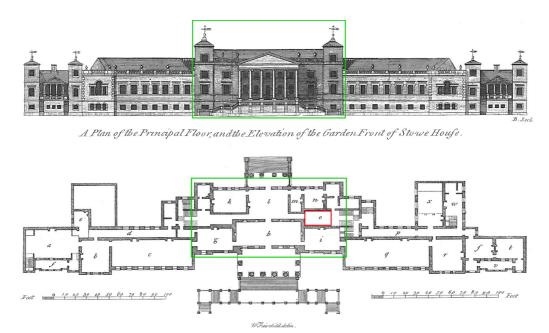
Plan and elevation of the principal floor at Stowe in 1766. The core of the original house is outlined in green and the east corridor is marked in red.
